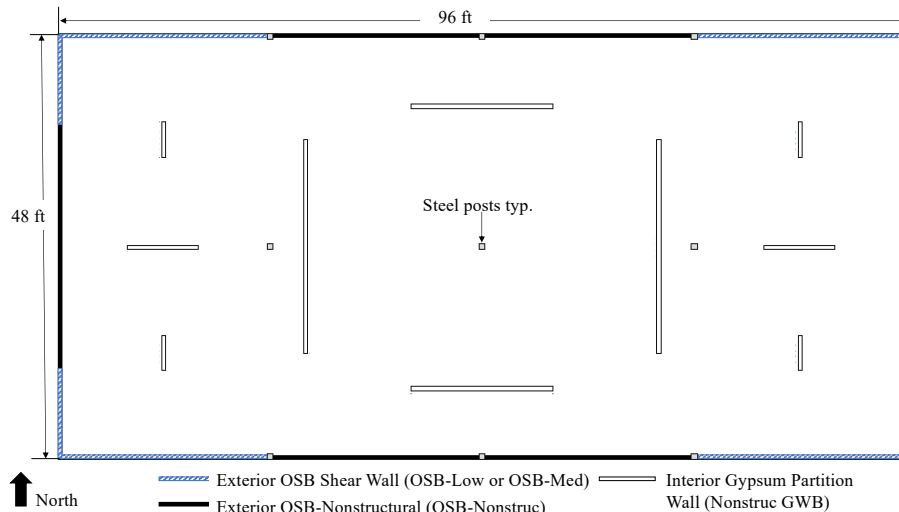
Plan view of the first story of the multi-family building, showing shear and bearing wall layout (modified from ATC 116, 2020). OSB is oriented strand board; GWB is gypsum wall board. Nail and framing details for the wall types listed are provided in Baird (2019) and Ziaei Ghehnavieh (2017).
